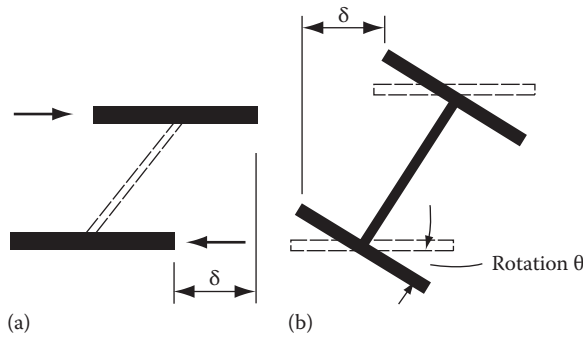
Plan section of I-shaped column: (a) displacement of flanges due to bimoment load and rotation due to geometric compatibility between flanges and web.
